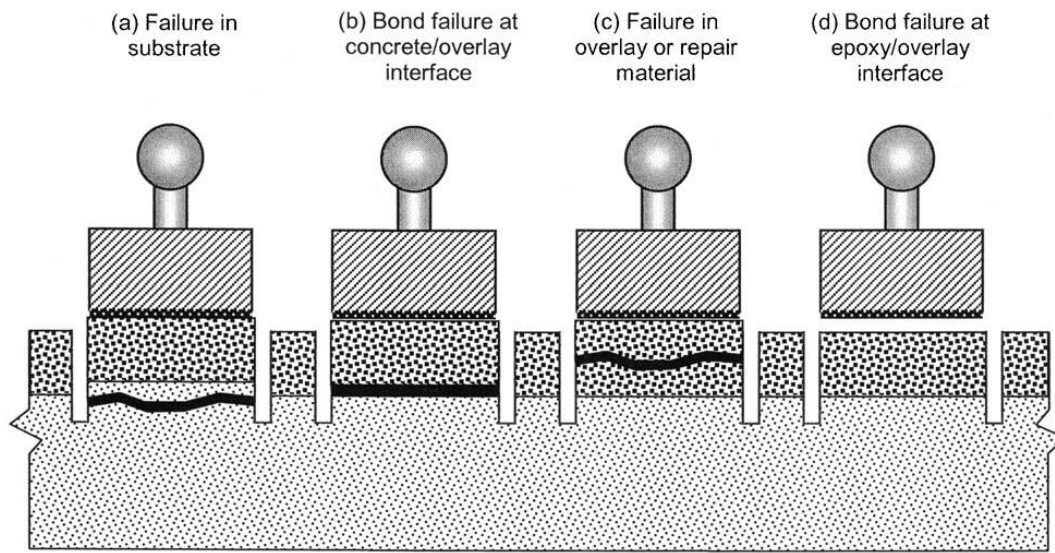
Pull-off test failure modes (ASTM C1583)
